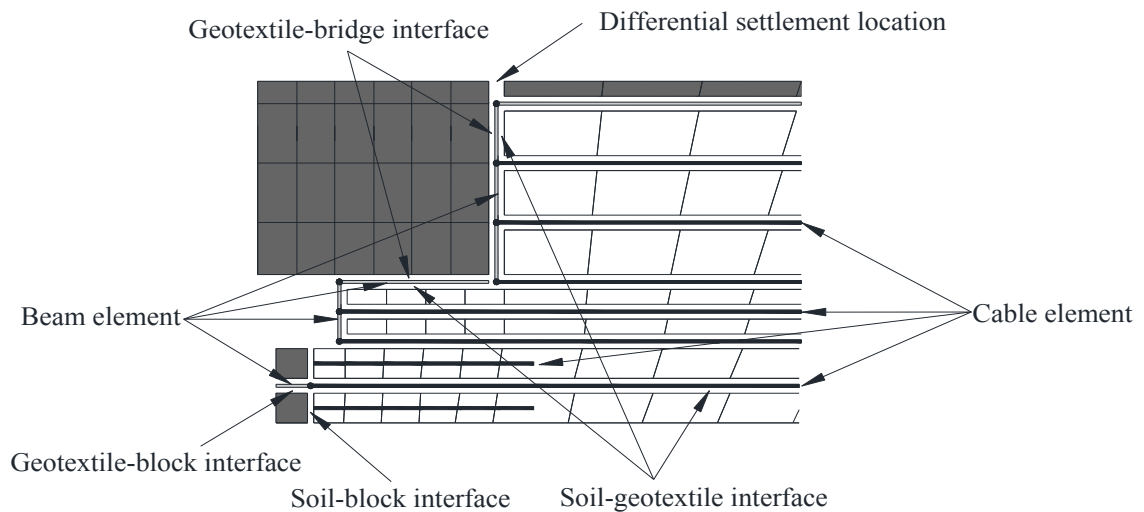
Reinforcement and interface details near connection between the bridge and right-side GRS abutment.
